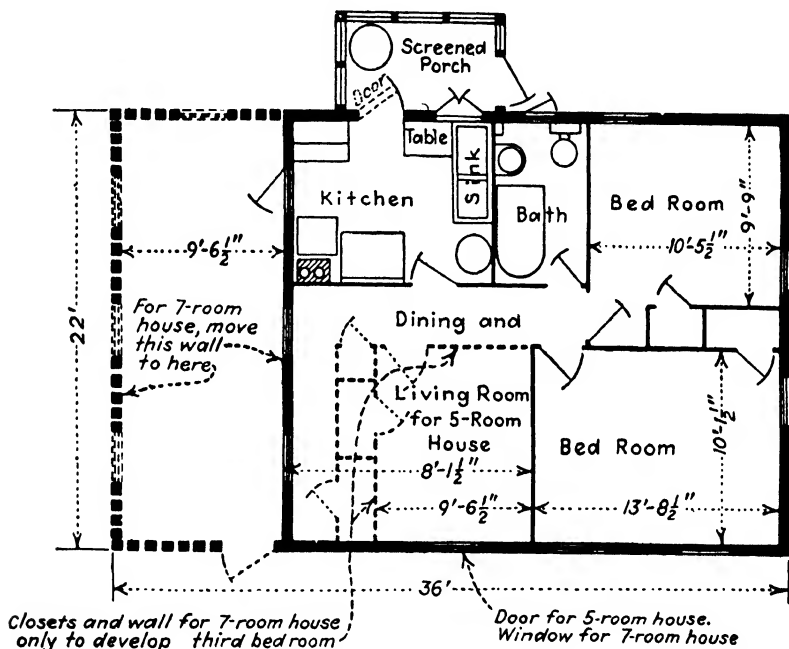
Floor plan of construction camp house (5 or 7 rooms).
